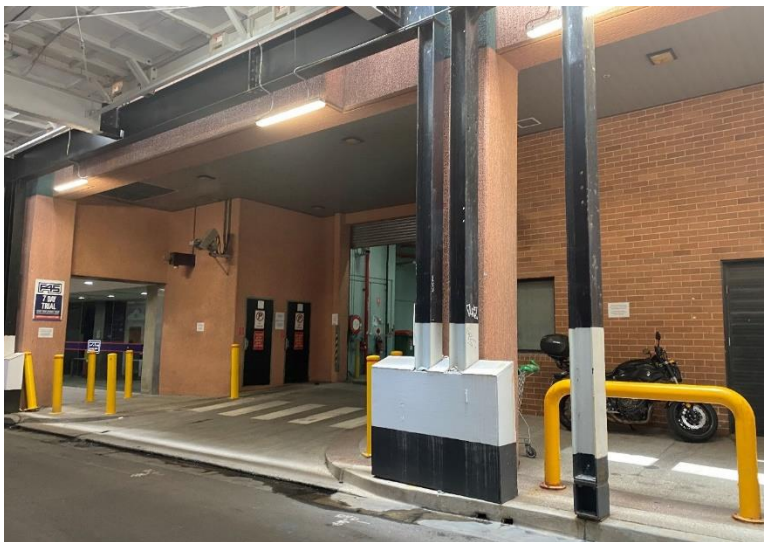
Existing vehicle entry to the Telstra building along Underwood Street (north)
